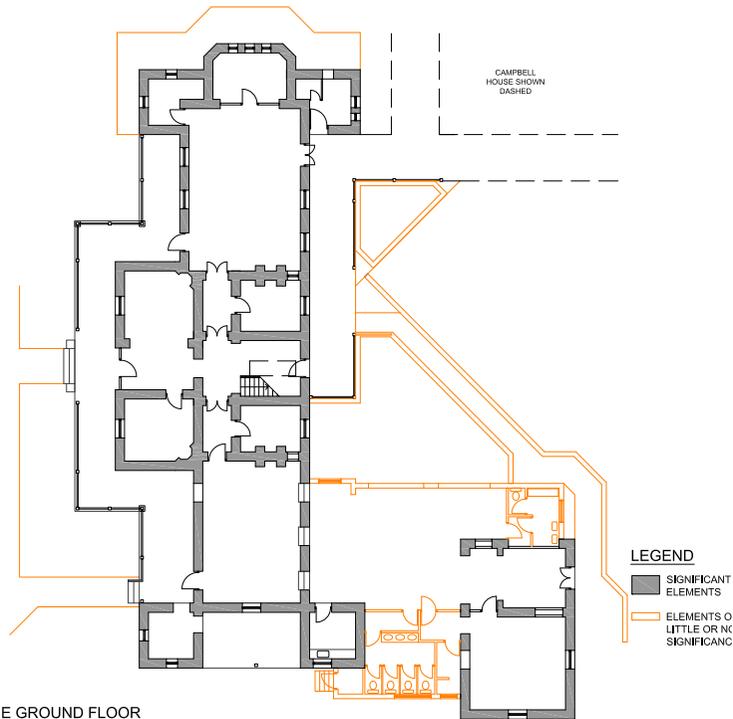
A - VICTORIA HOUSE GROUND FLOOR
